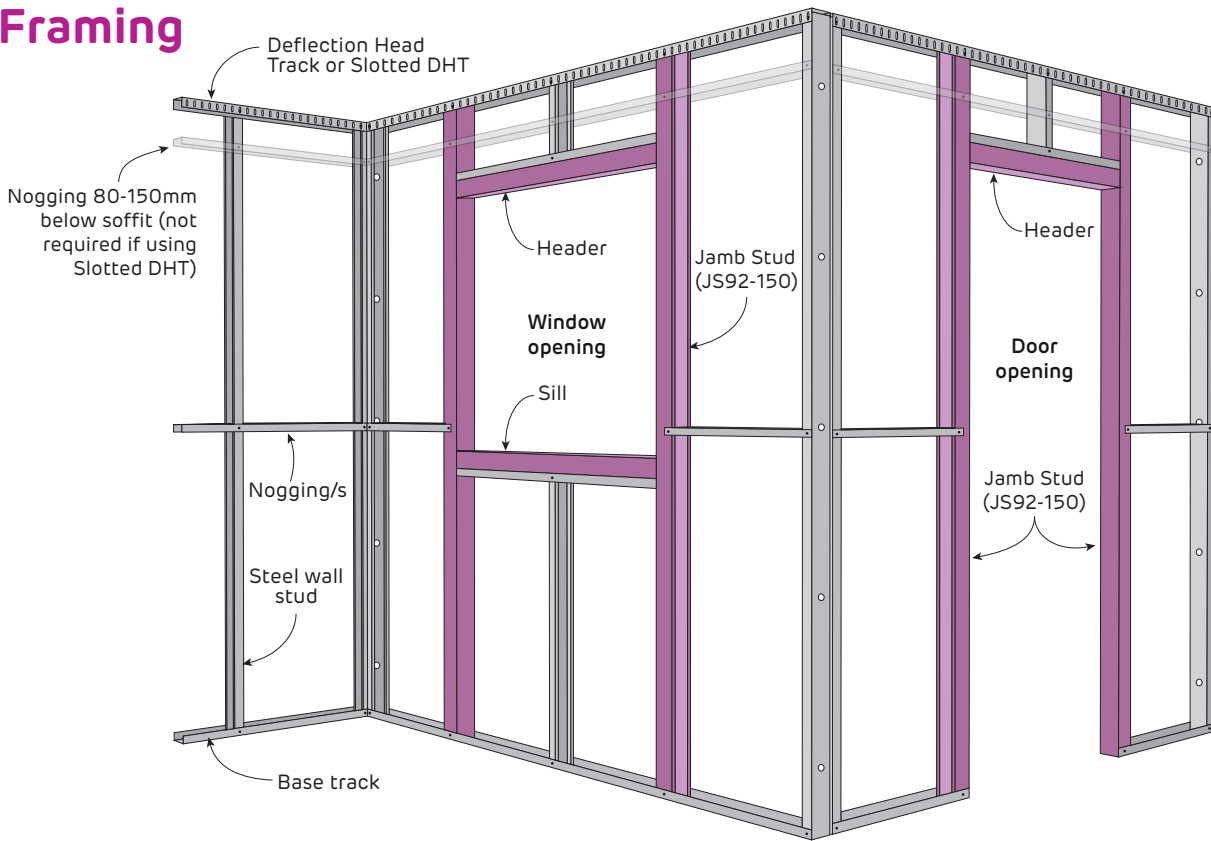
Typical External Steel Frame Wall with Window and Door Openings
